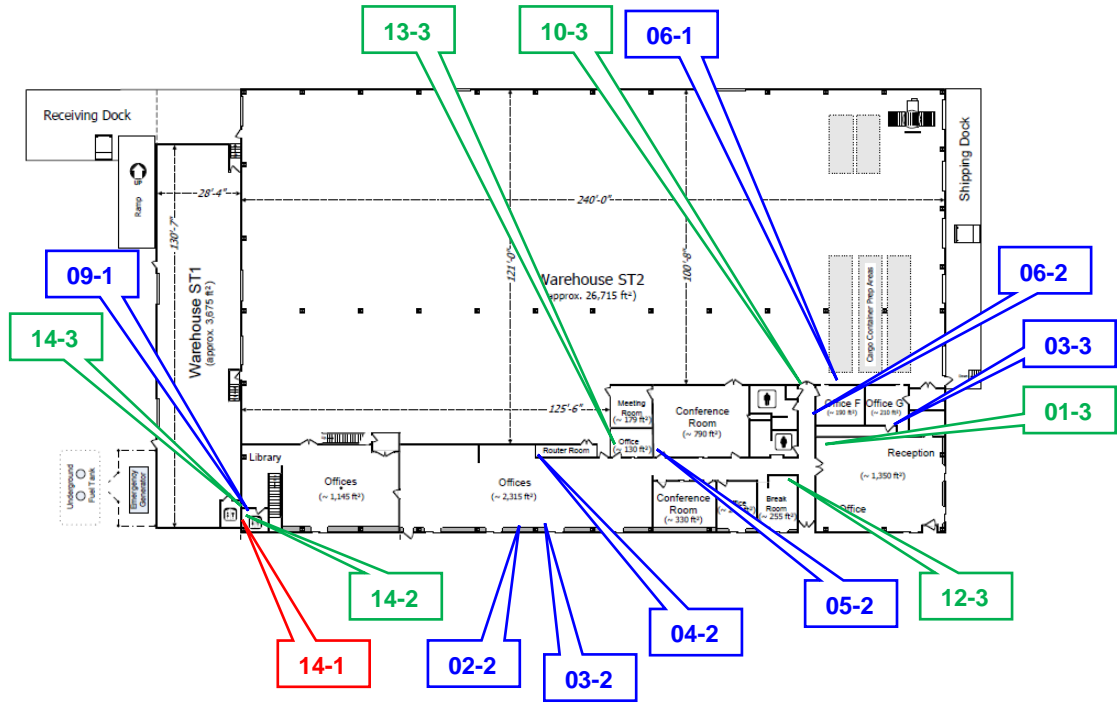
ACM Bulk Sample Locations 1<sup>st</sup> Floor
